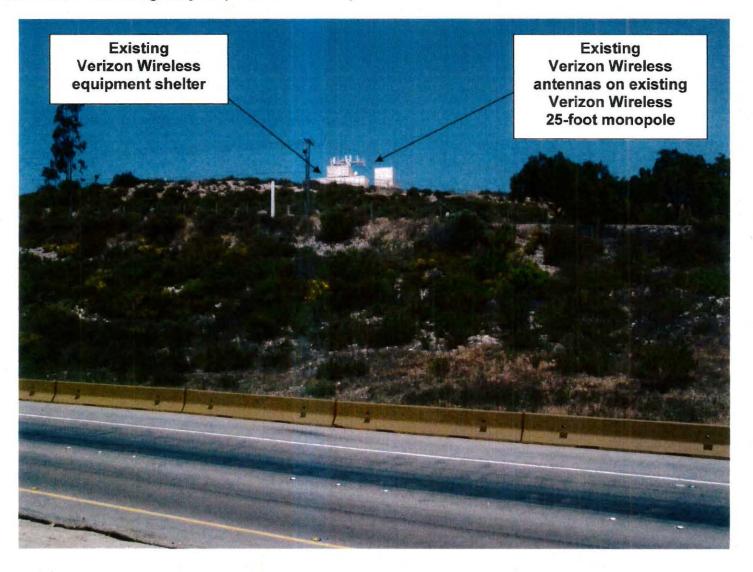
PHOTO SURVEY VIEW 4: Looking north towards the existing project site with the Verizon Wireless components of this multi-carrier site called out (overall site managed by American Tower, Inc.).
